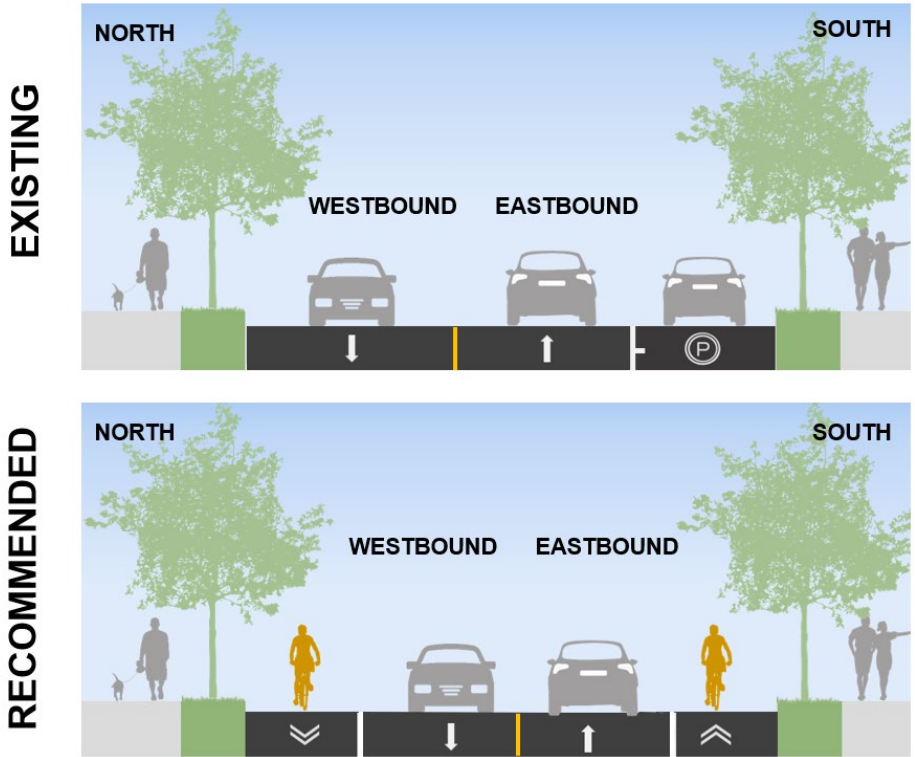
Existing and Recommended Cross-Section for Horner Avenue
